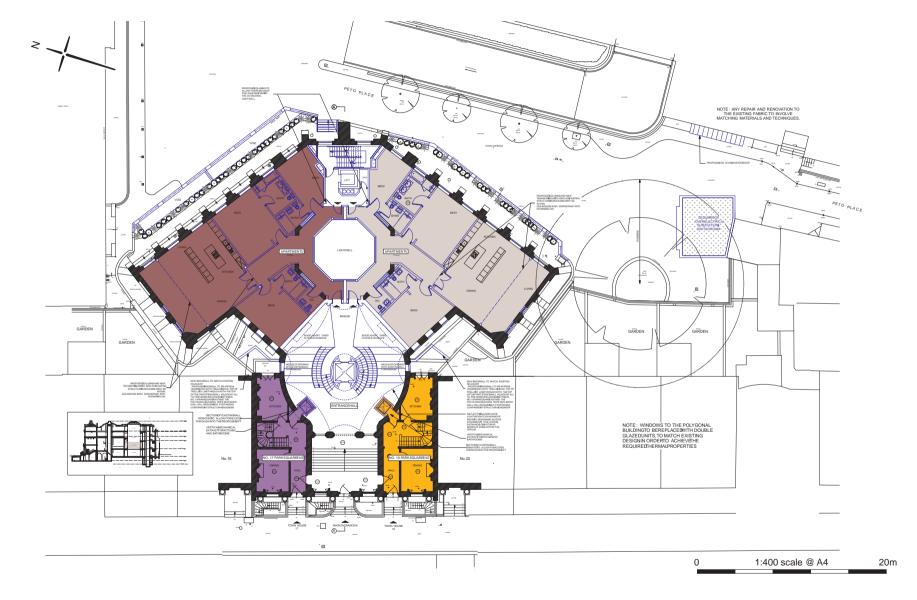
Plan of proposed upper ground level (HUB Architects and Designers Dwg. No. 1126-PL-03 Rev N June/2014)
